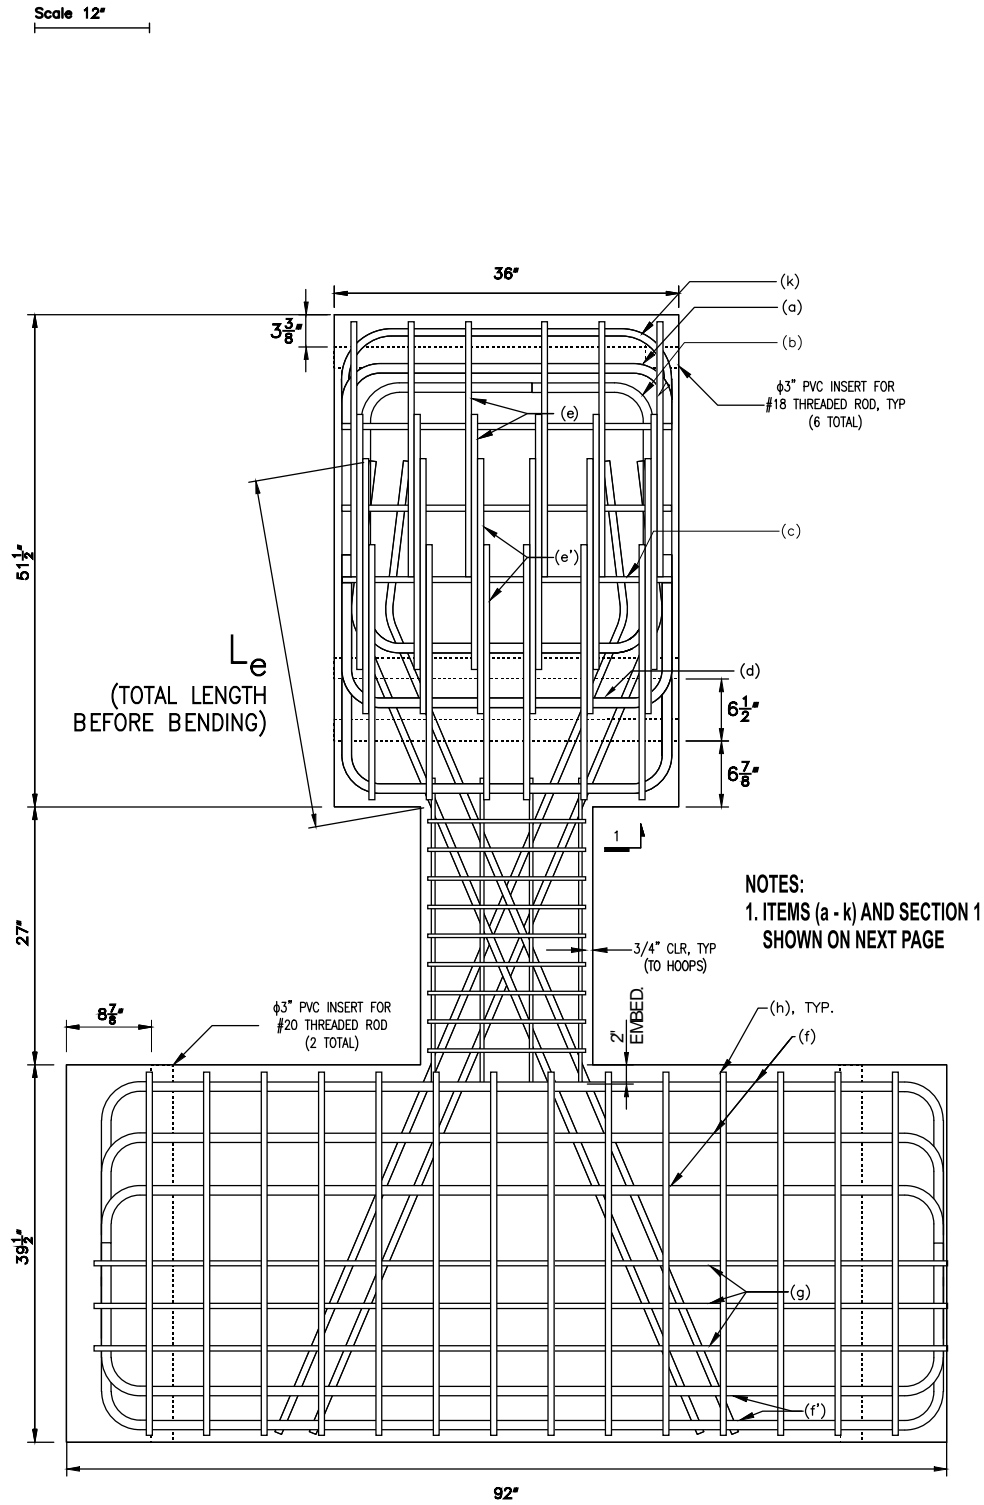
Elevation view of D120-1.5 (1 in. = 25.4 mm)
